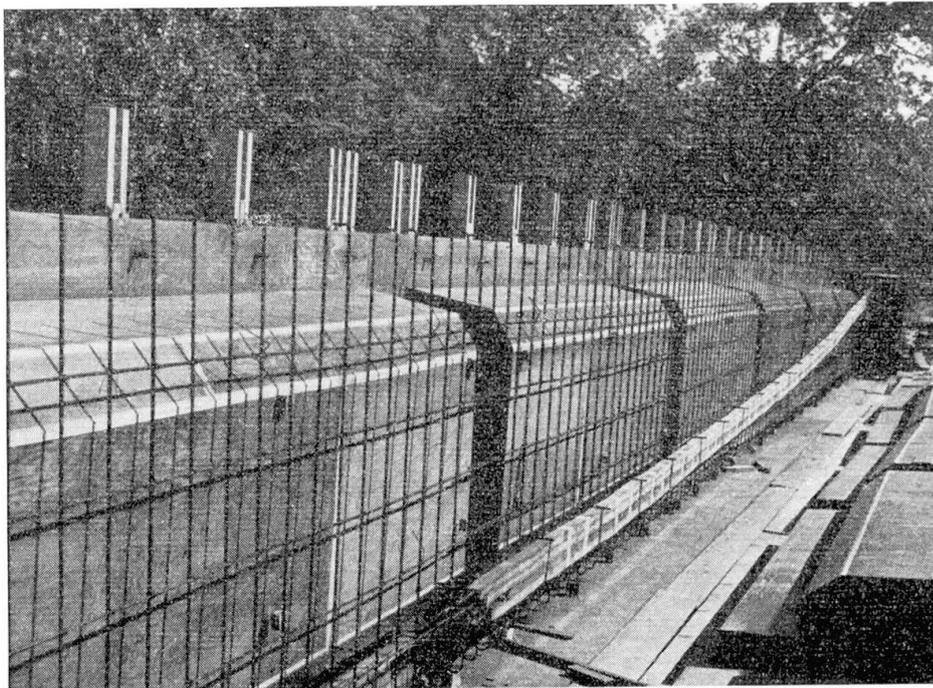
Formwork Details, Reinforcing Steel and Rubber Cores
